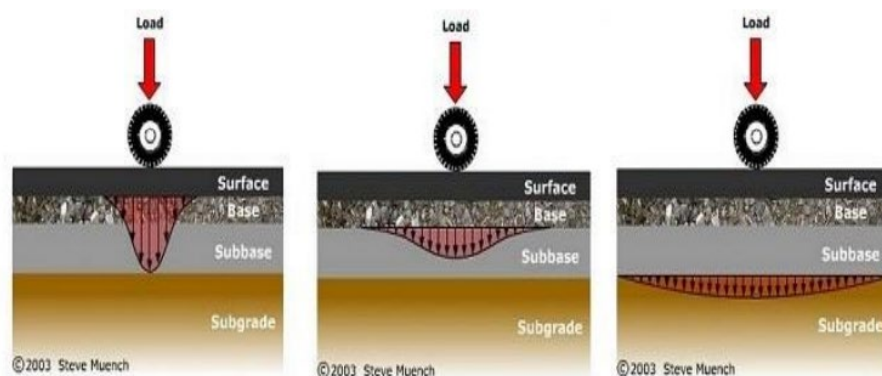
Typical Flexible Pavement and Load Distributions [9]
